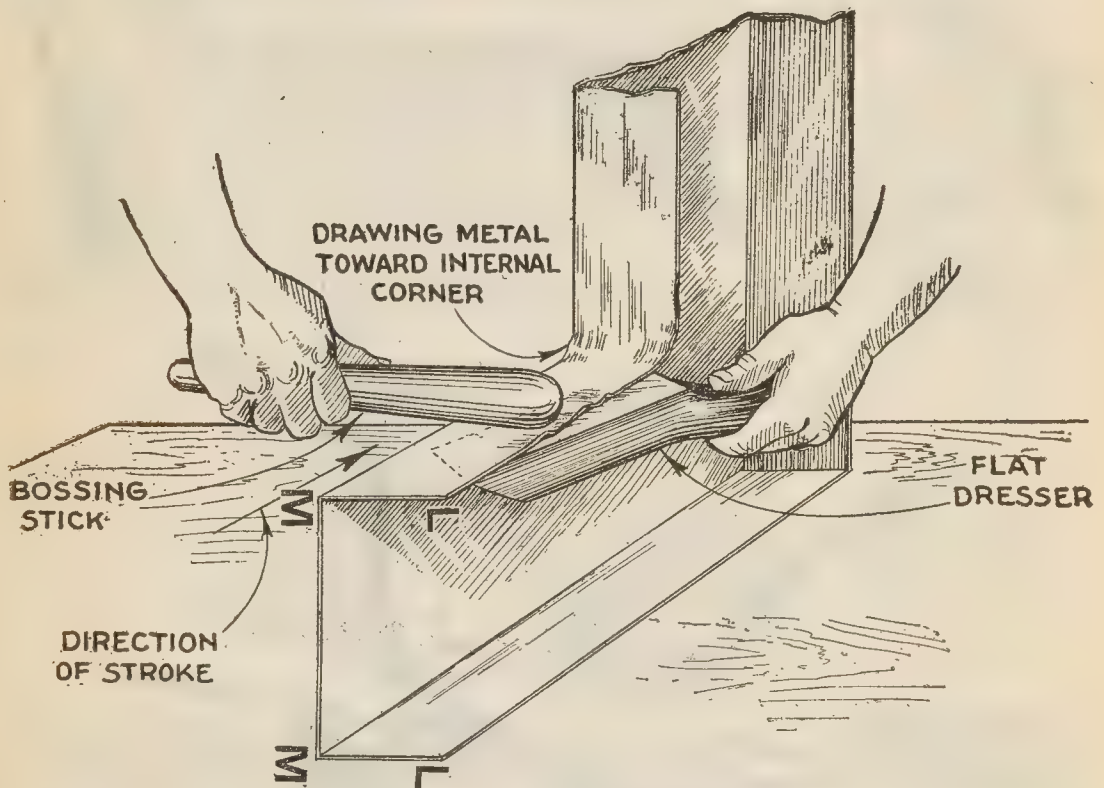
,552.—*Beating box gutter corner, 9.* Drawing metal toward internal corner by beating with round dresser or bossing stick using flat dresser as support.
